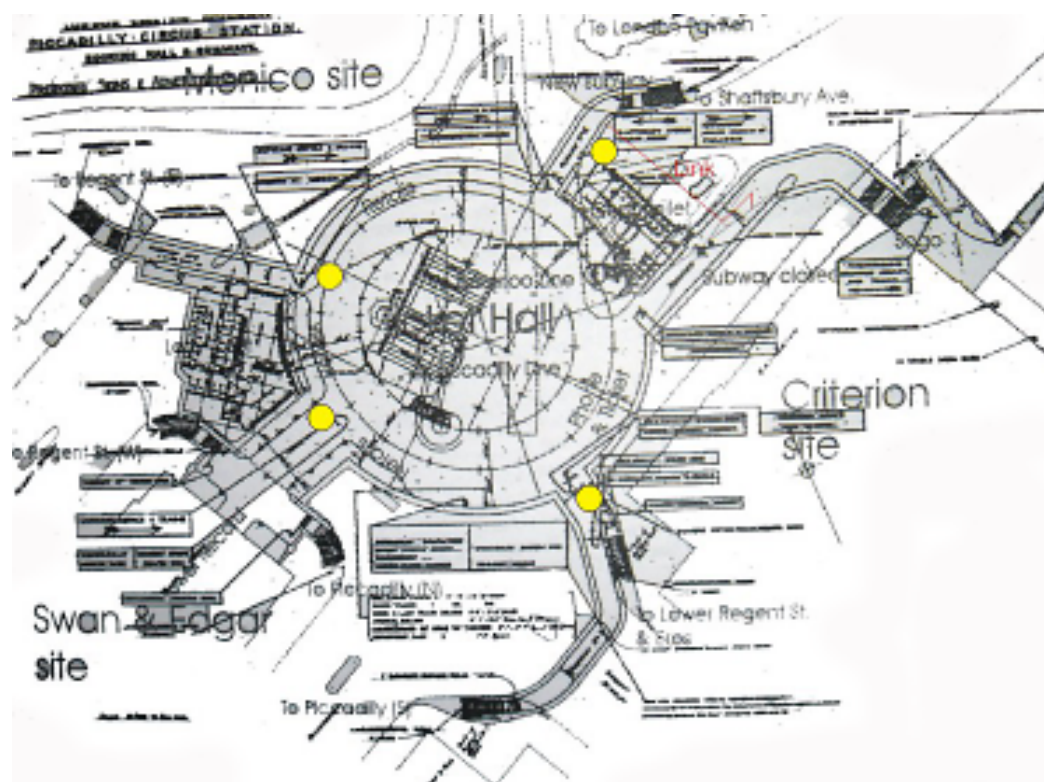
B Observation locations at Piccadilly Circus Underground station, plan at ticket hall level (LUL 1996)
